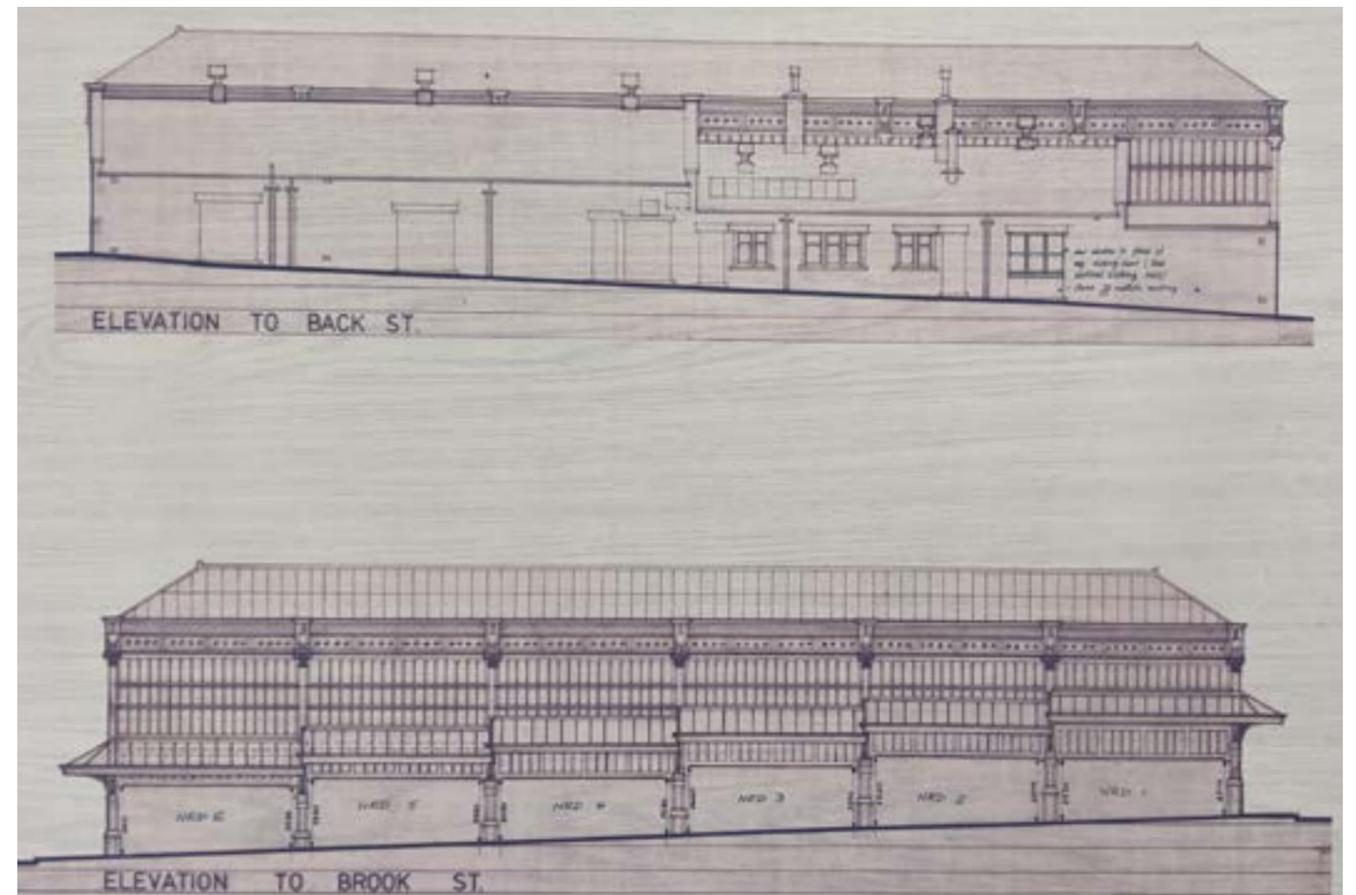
Existing elevations: repairs component location plan 1979 © Kirklees Council
